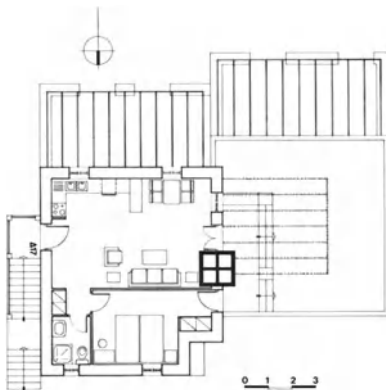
Use of chimney to create ventilation in apartments when natural cross ventilation through window openings is insufficient
